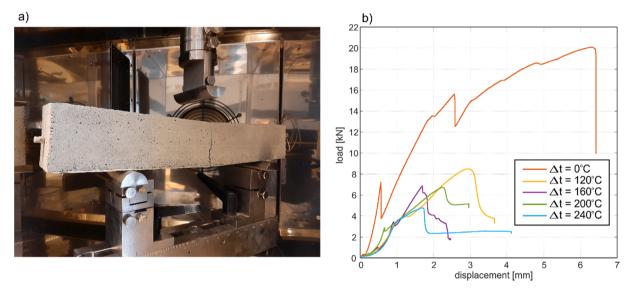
Destructive tests in elevated temperature: (a) concrete beam loaded in the thermal chamber, (b) load—displacement curves for concrete beams with GFRP rod subjected to elevated temperatures and external load.
